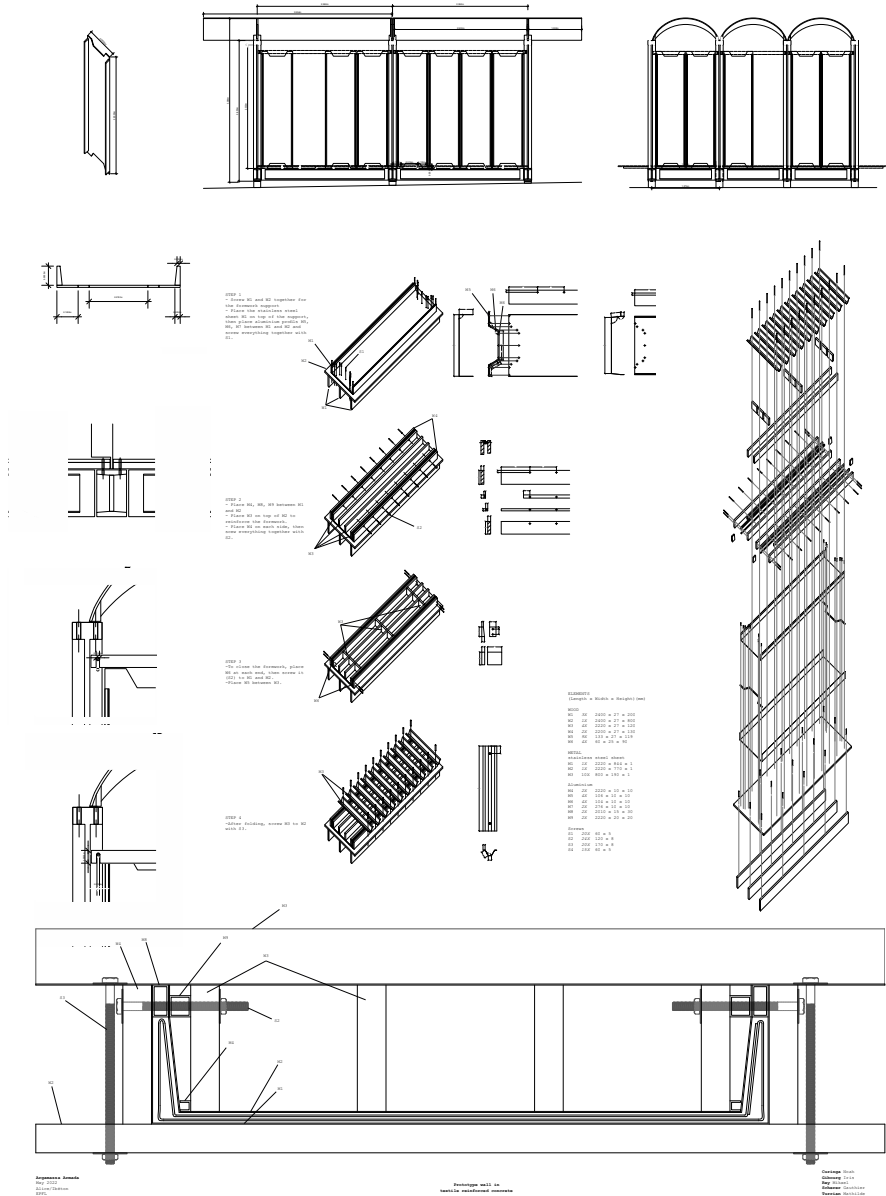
Drawing of mold for wall prototype, UE ENAC 2022
